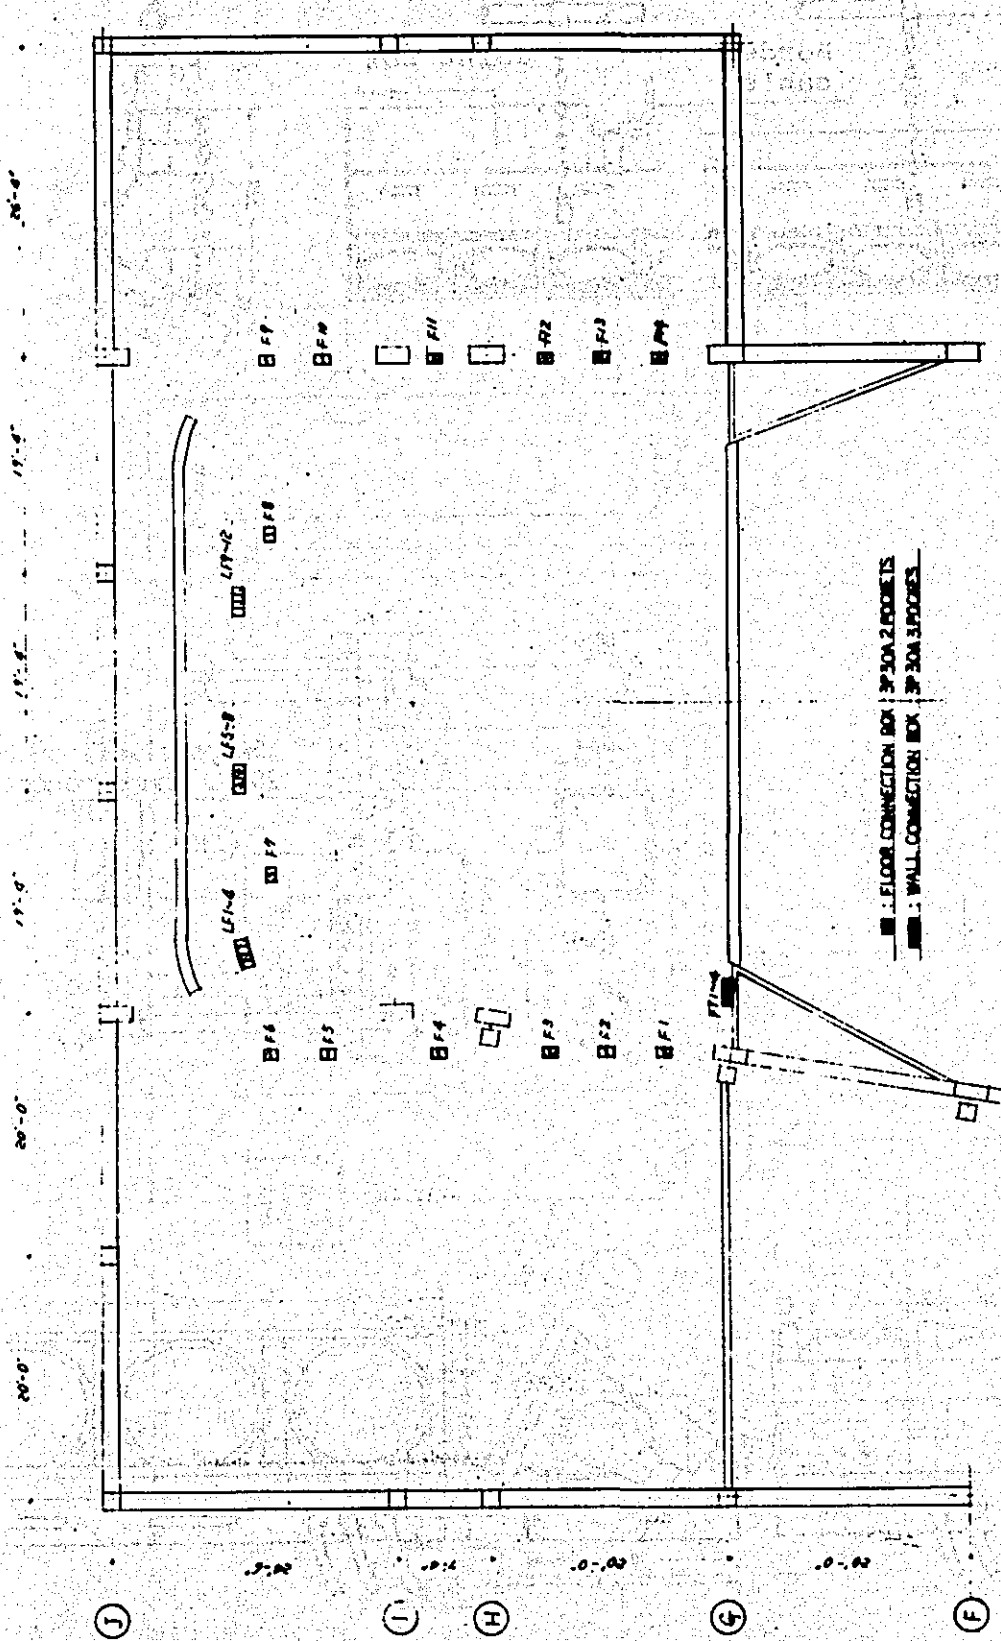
Scheme of Floor Inlet Boxes on Stage
